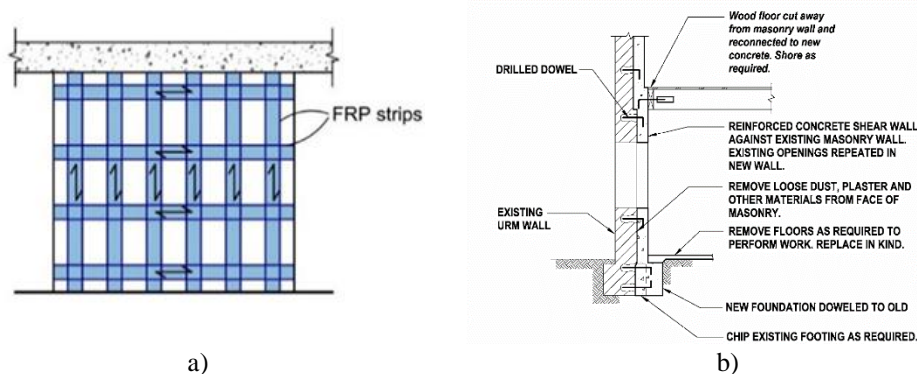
Techniques for seismic retrofitting of masonry walls: a) thin overlays – FRP strips [22] and b) thick overlay (new RC shear wall) [38].
